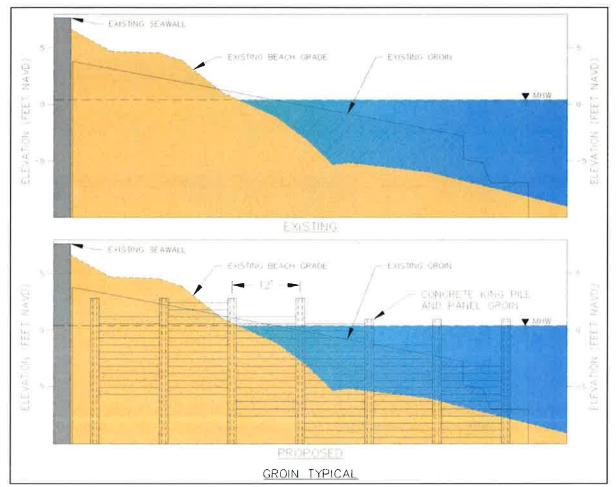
Conceptual Replacement with Concrete King Pile and Panel Groin.
